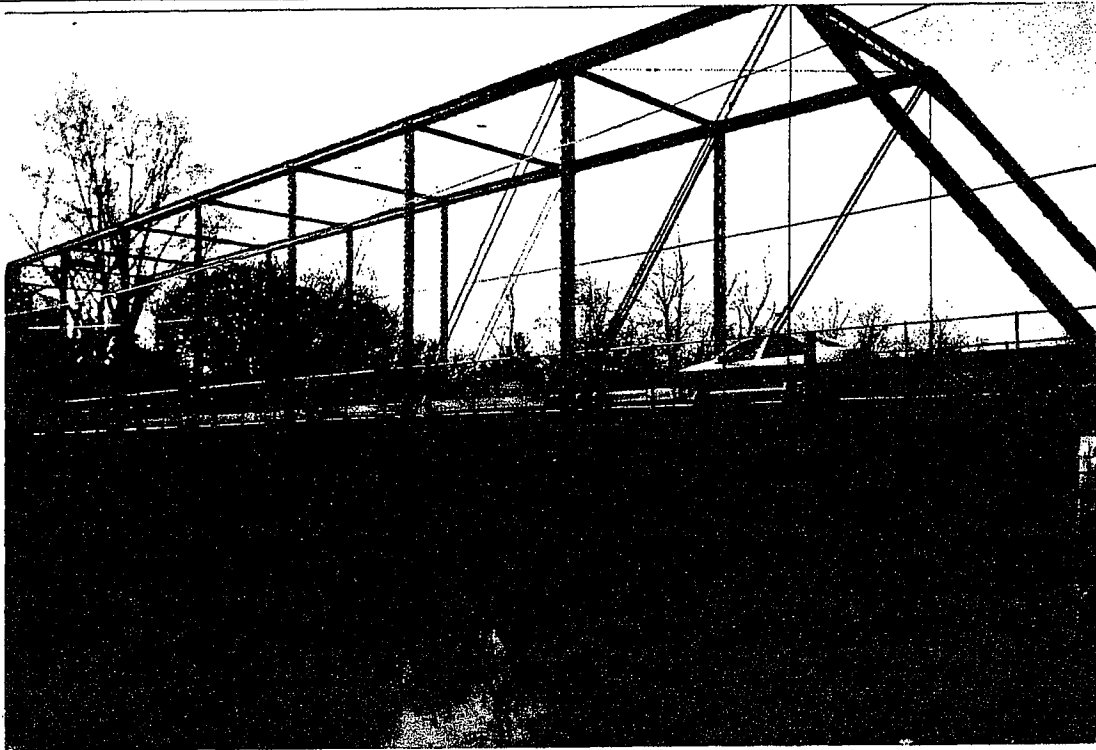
Existing Single Lane Bridge that will be replaced and later used for Bike Trail Bridge
